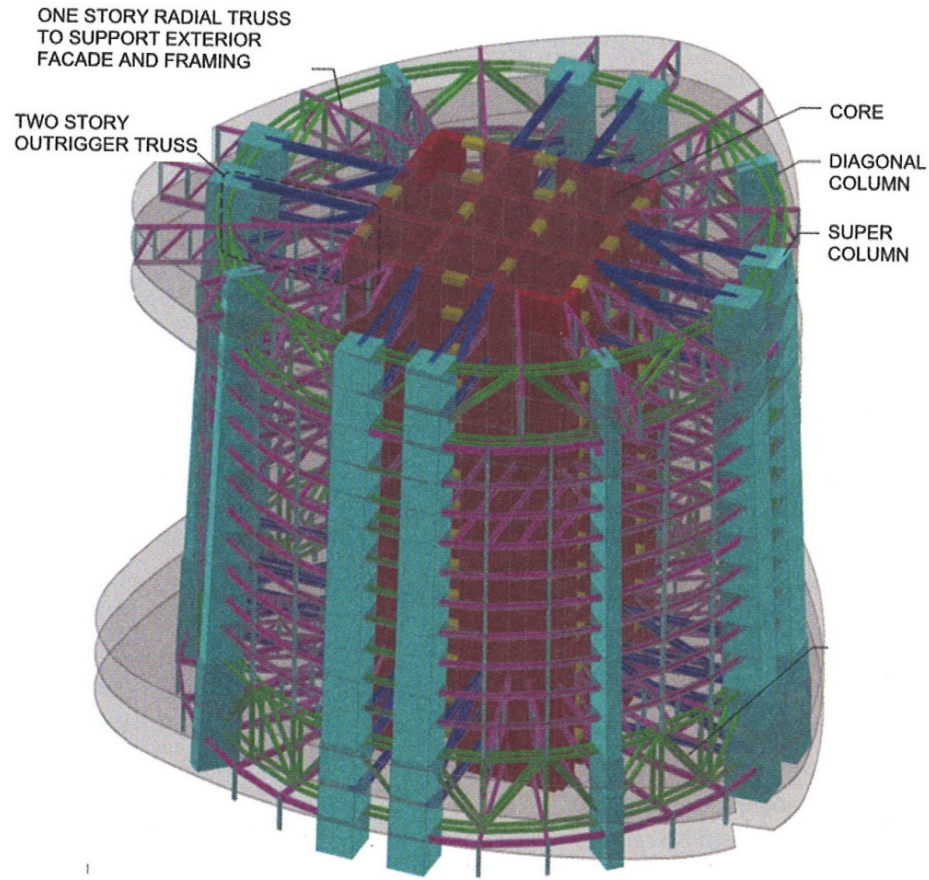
Shanghai Tower - isometric of core, megacolumns, outrigger, and belt trusses
